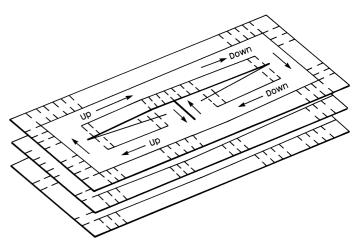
Ramped floor car park with a clearway down (departure) ramp Fig 4.19 Warped slab car park
